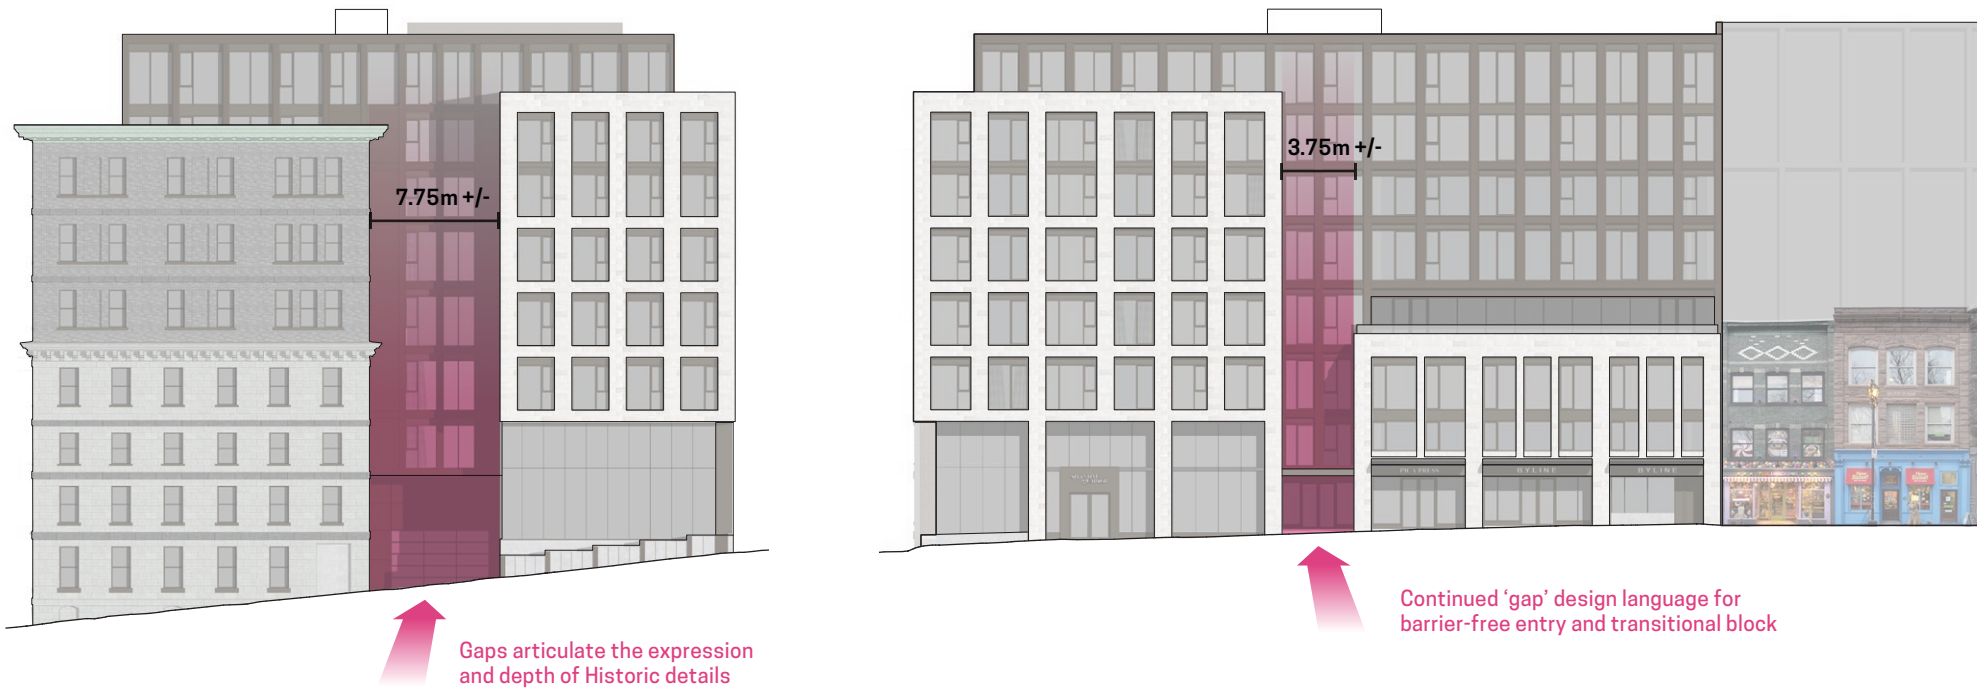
d and 2.2e Streetwall Width: New construction gaps on George (left) and Barrington (right) to maintain visual prominence of heritage resources and barrier-free entry
